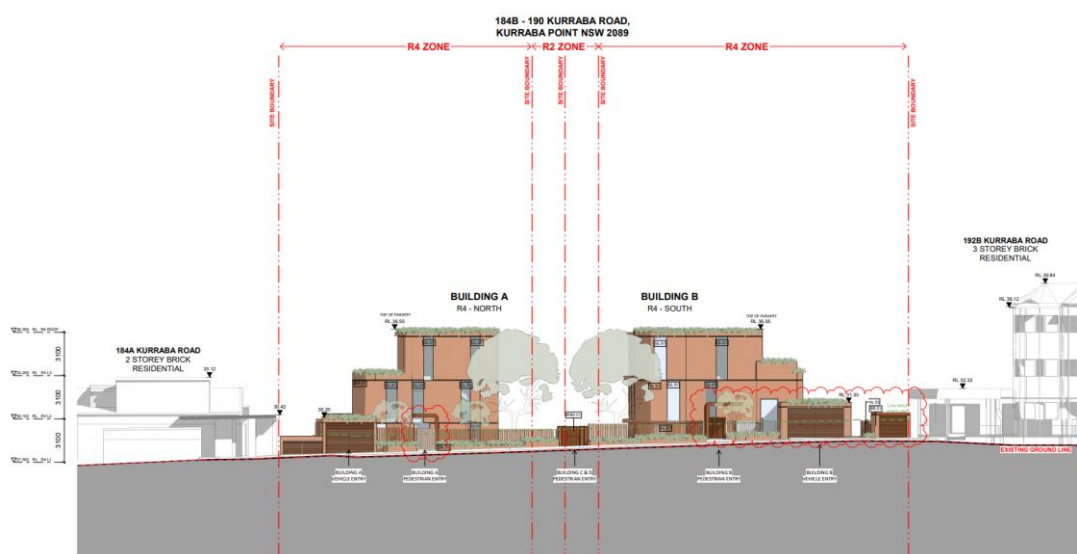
Drawing A204 - West Elevation (Source: KTA)
